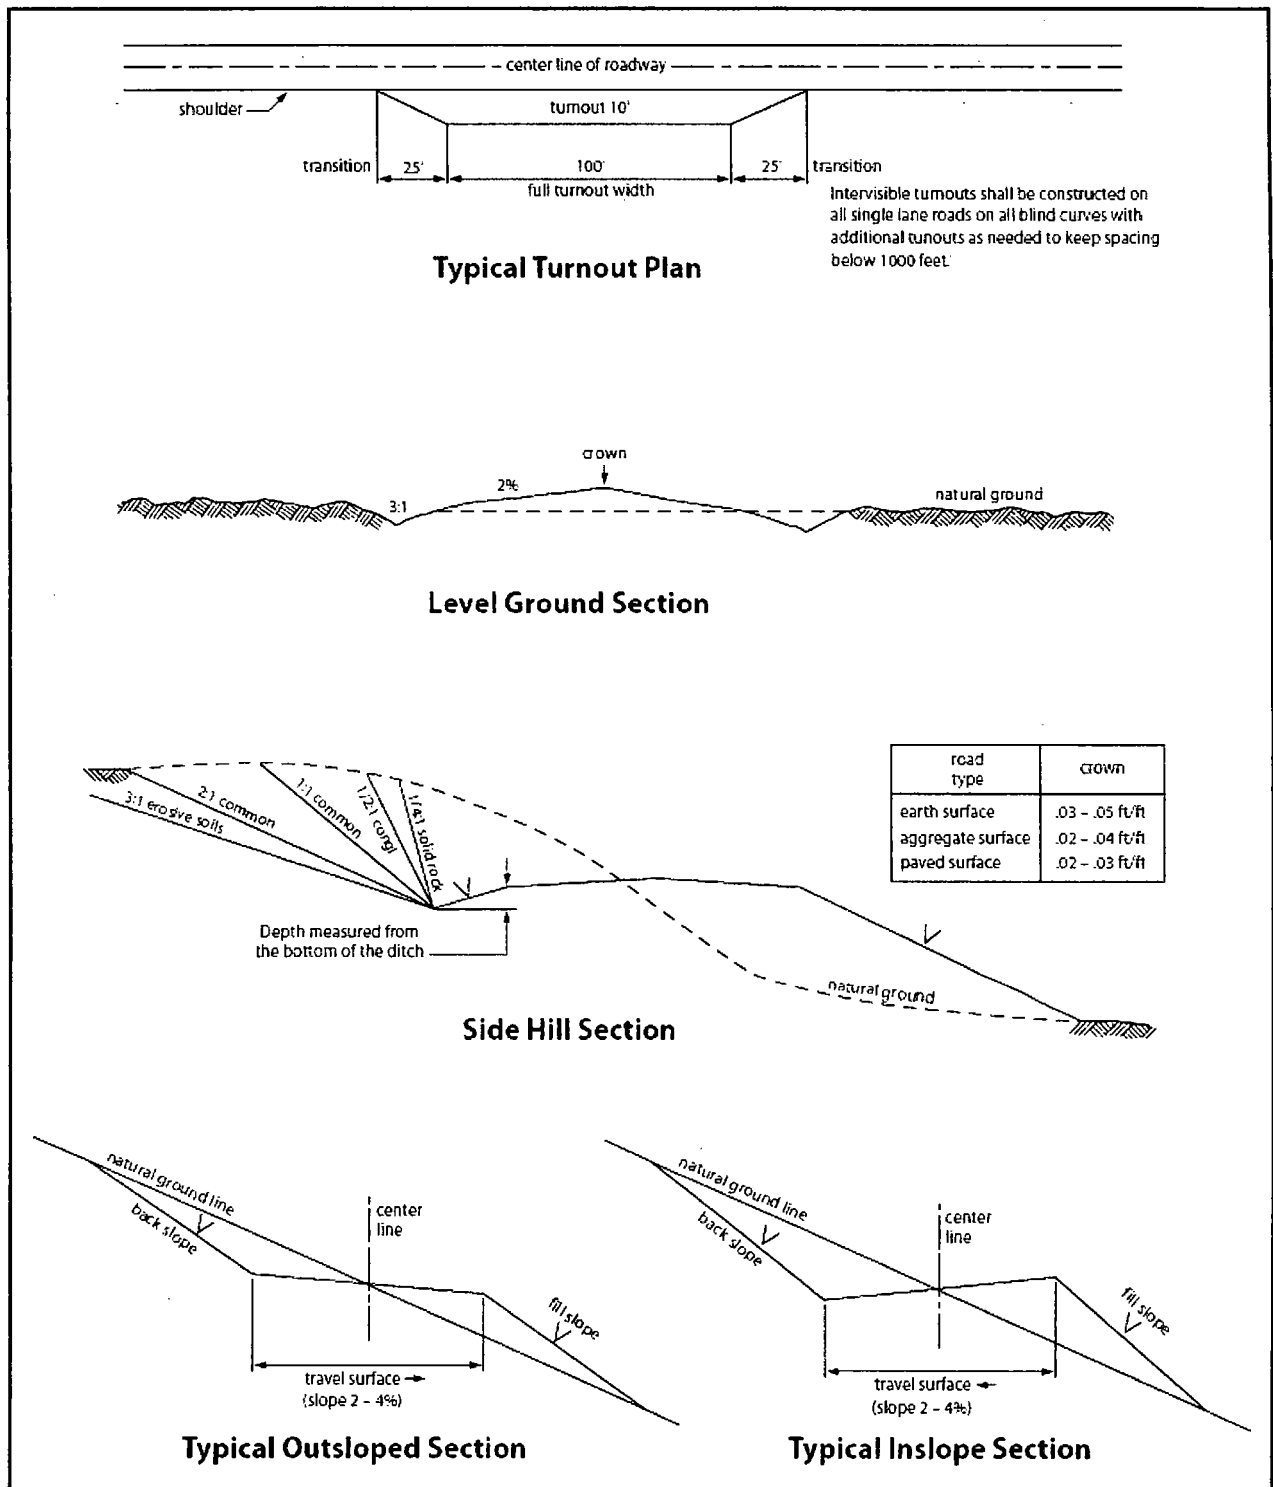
Cross-sections and plans for typical road sections representative of BLM resource or FS local and higher-class roads.
